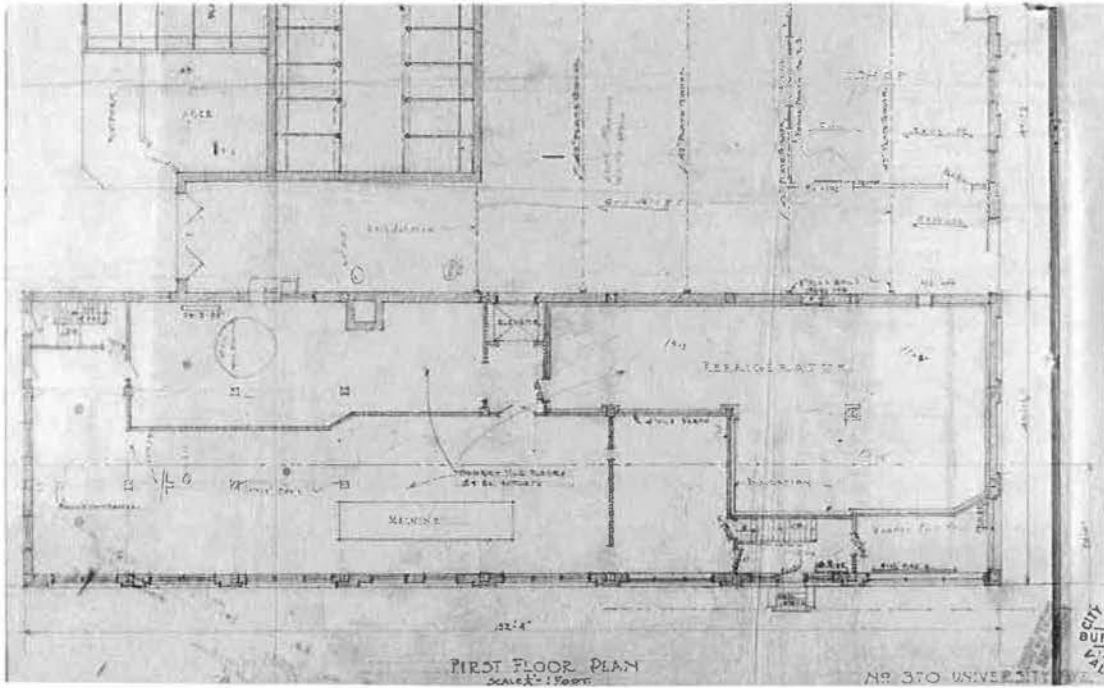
1931 first floor plan prior to renovation. North is to the bottom of the plan.
